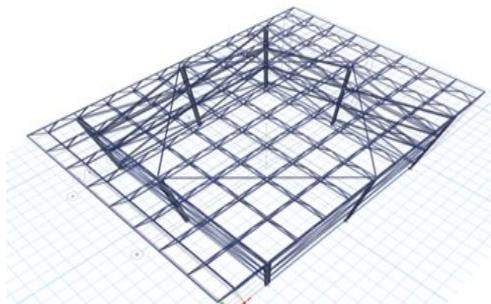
Space structure with double axis stiffness with vertical and horizontal centre centre bracing roof and fixed support
